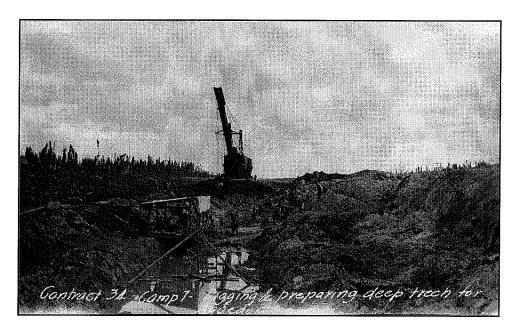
Slope failure of the aqueduct trench near Mile 90. (Construction Photograph No. 360)
